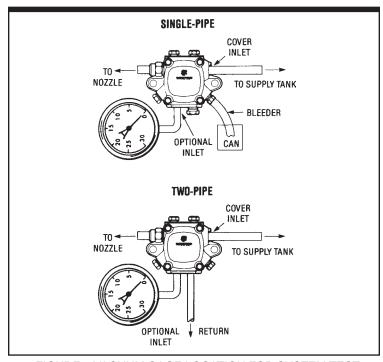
VACUUM GAGE LOCATION FOR SYSTEM TEST
